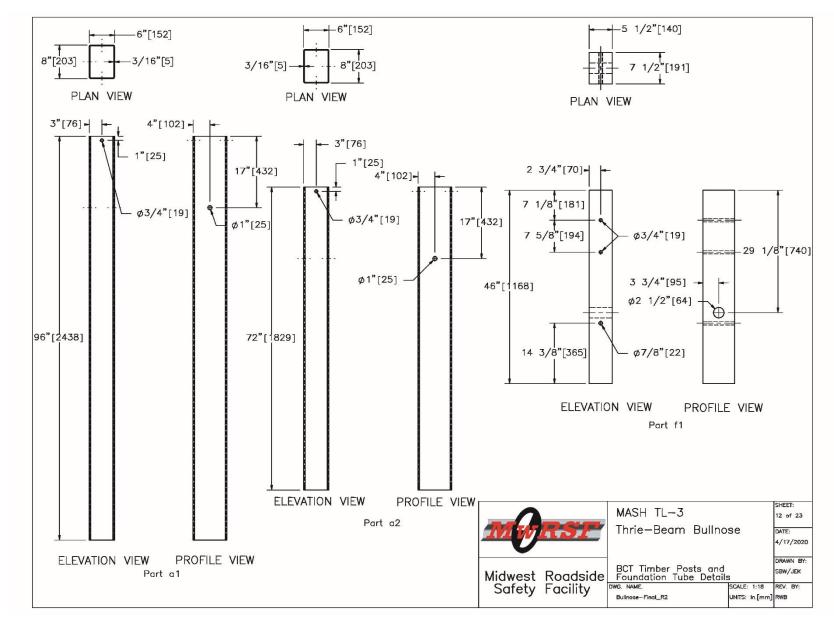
BCT Timber Post and Foundation Tube Details, Bullnose Final
